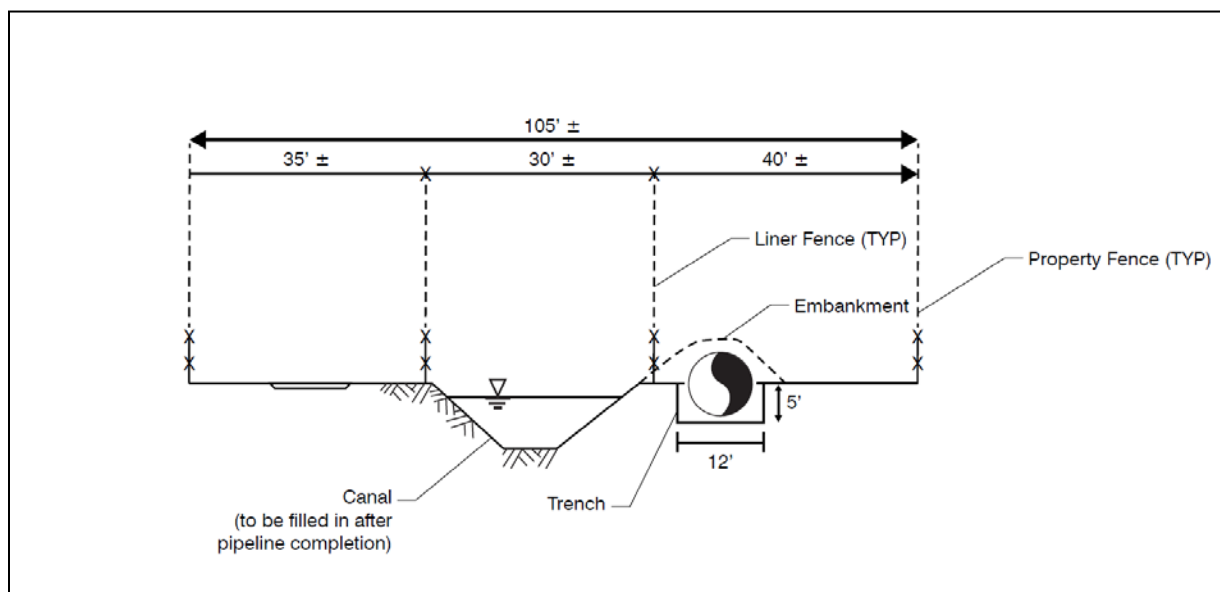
Pipeline Installed in an Embankment on top of the Operations Road
